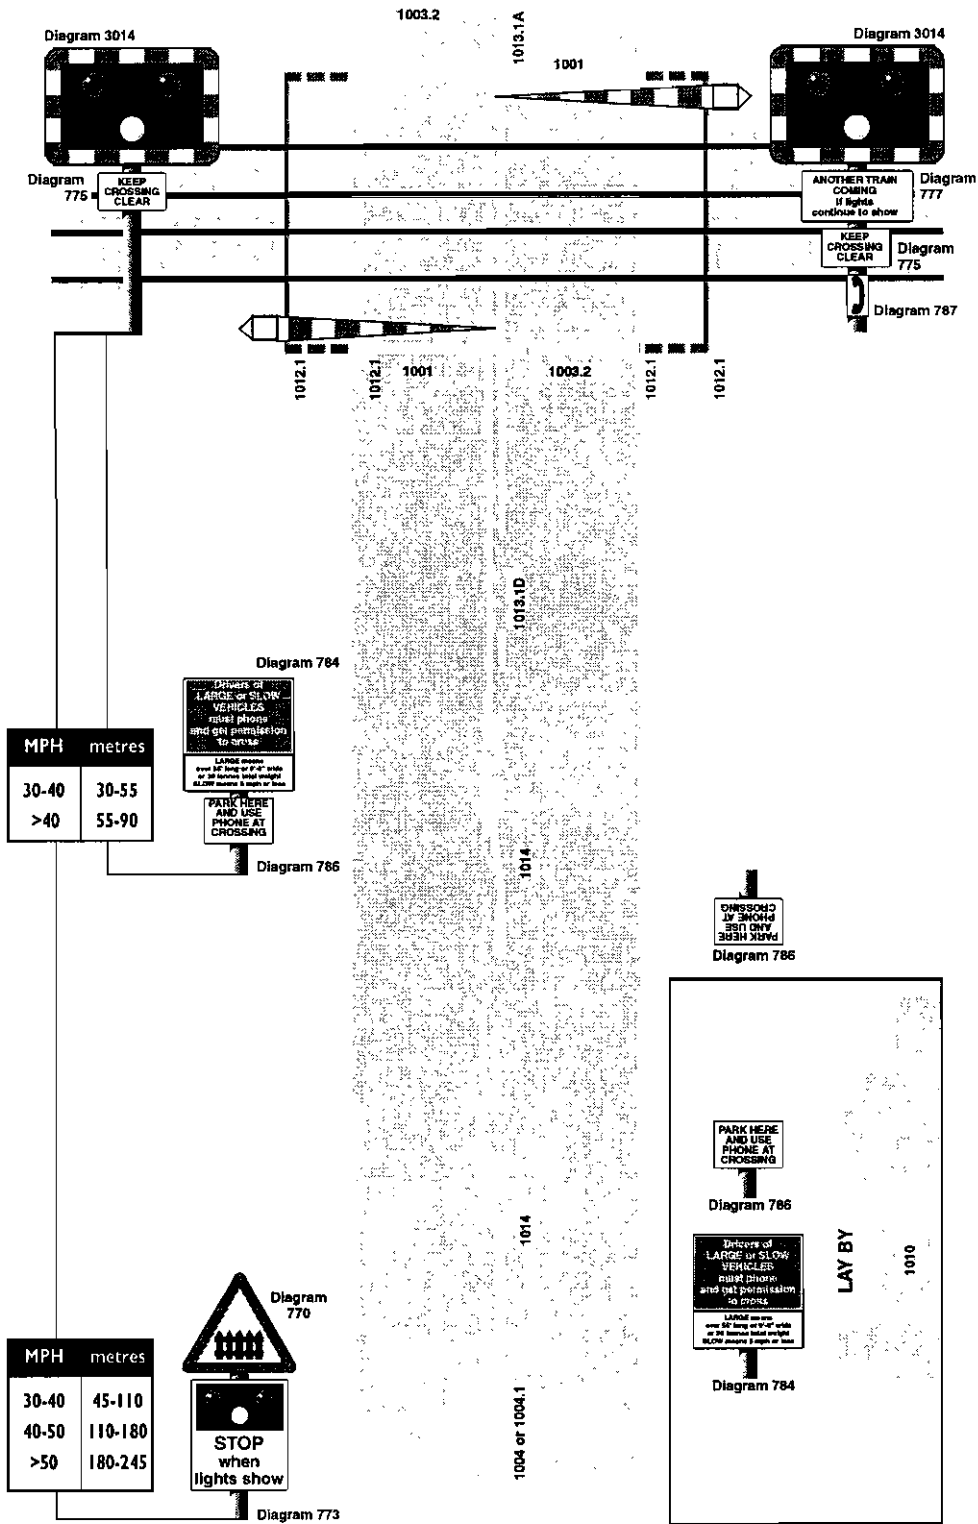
Typical layout of automatic half barrier crossing or automatic barrier crossing (locally monitored)
